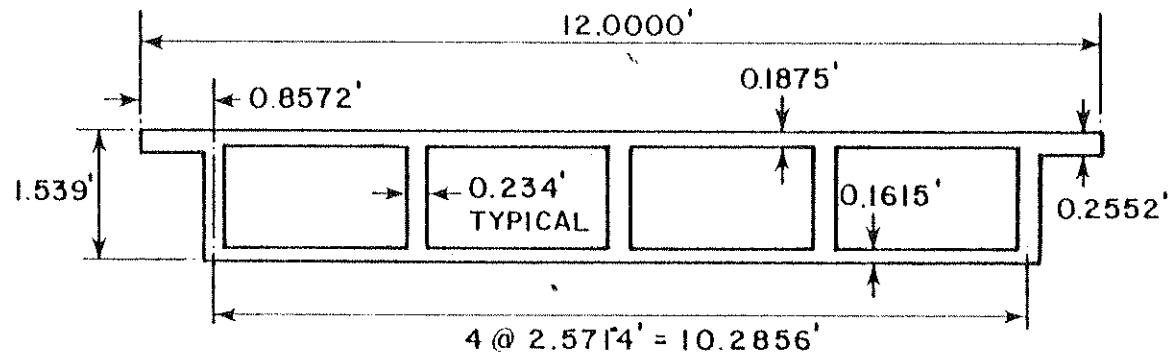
TYPICAL BOX GIRDER CROSS-SECTION AS MODELLED IN CELL ANALYSIS
